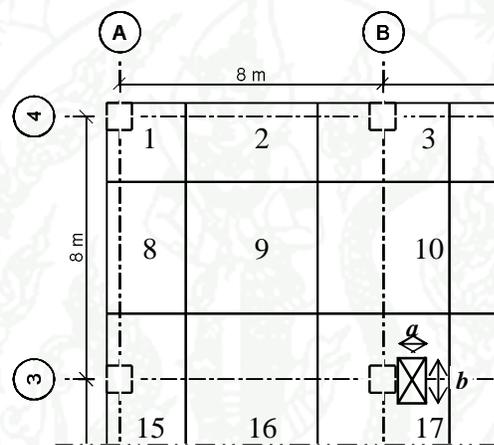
Flat plate model with opening at the interior face of interior column [O-8]
